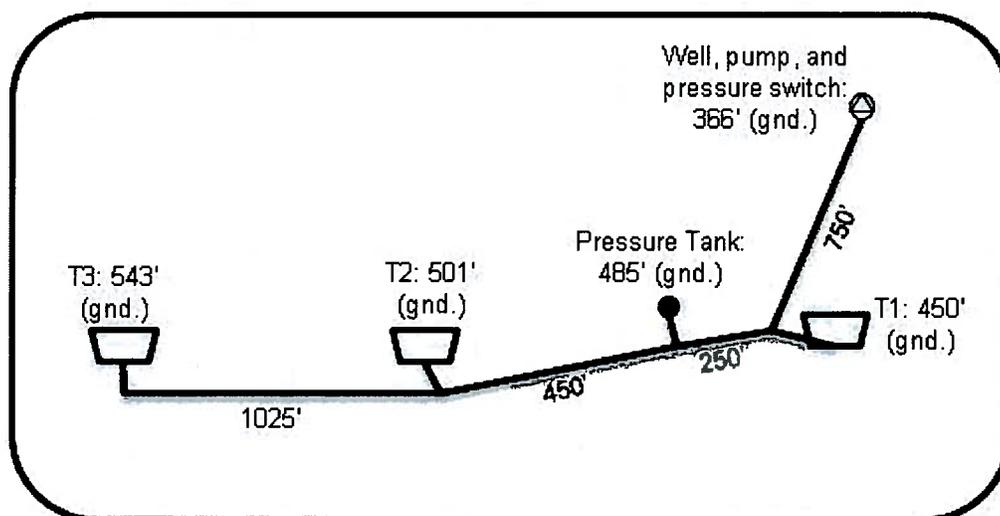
Layout for Example 2 - Remote Pressure Tank
